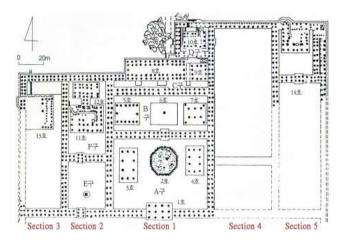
Layout of Sangorisa Temple Site. Sketch by Juhyung Lee.
